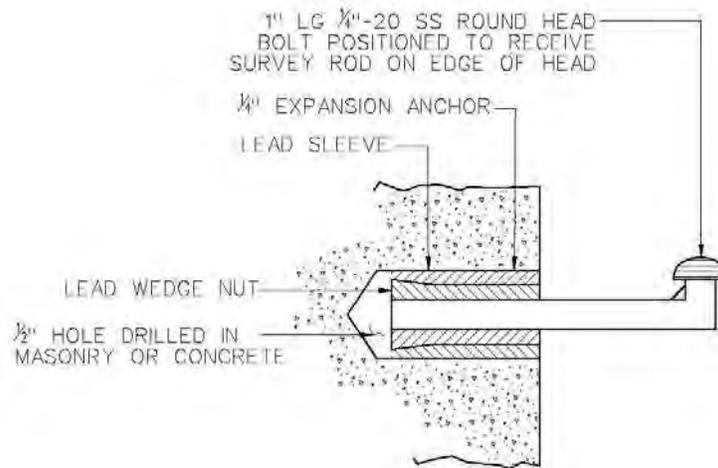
Deformation Monitoring Point in Vertical Masonry or Concrete Surface
